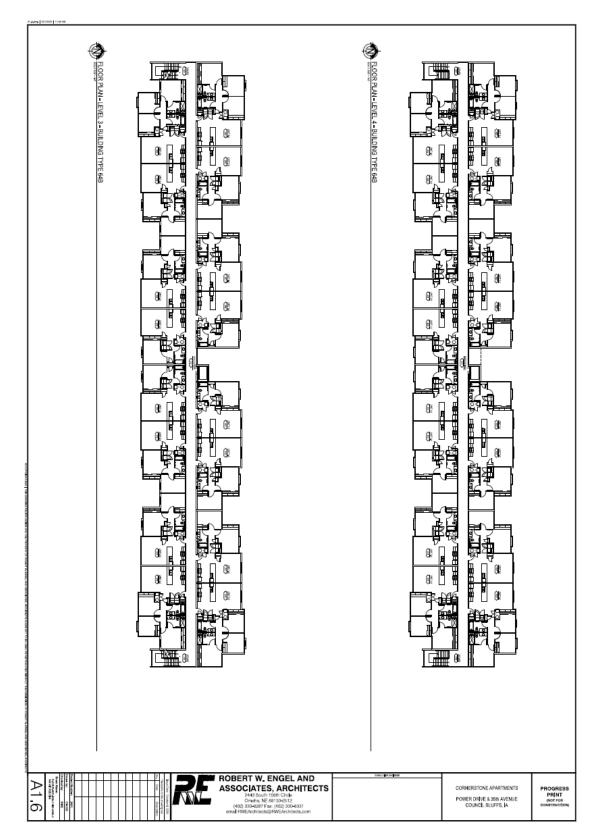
PROPOSED FLOOR PLANS (cont.)
